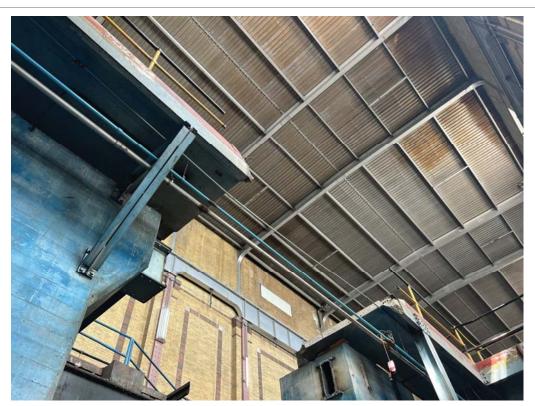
Main Floor – Walkway framing incomplete. Area currently taped off as not safe. Fall risk.
